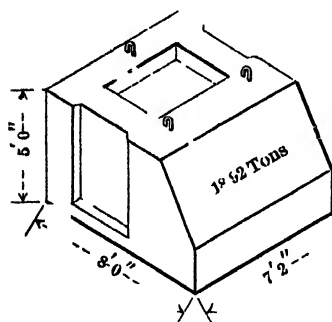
Face Blocks of Buffalo Breakwater. (See p 307)
